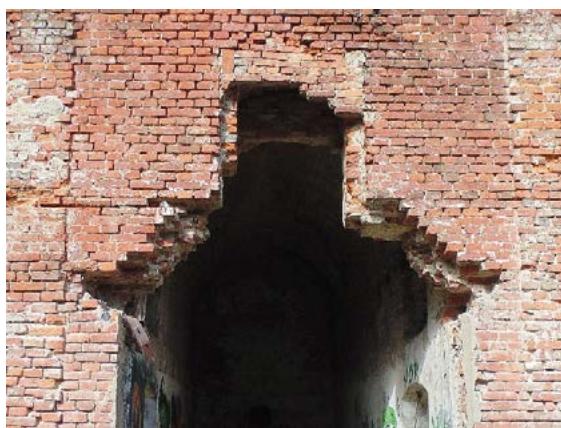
The northern part of the Red Barracks. Significant shortages and cavities in the wall.
